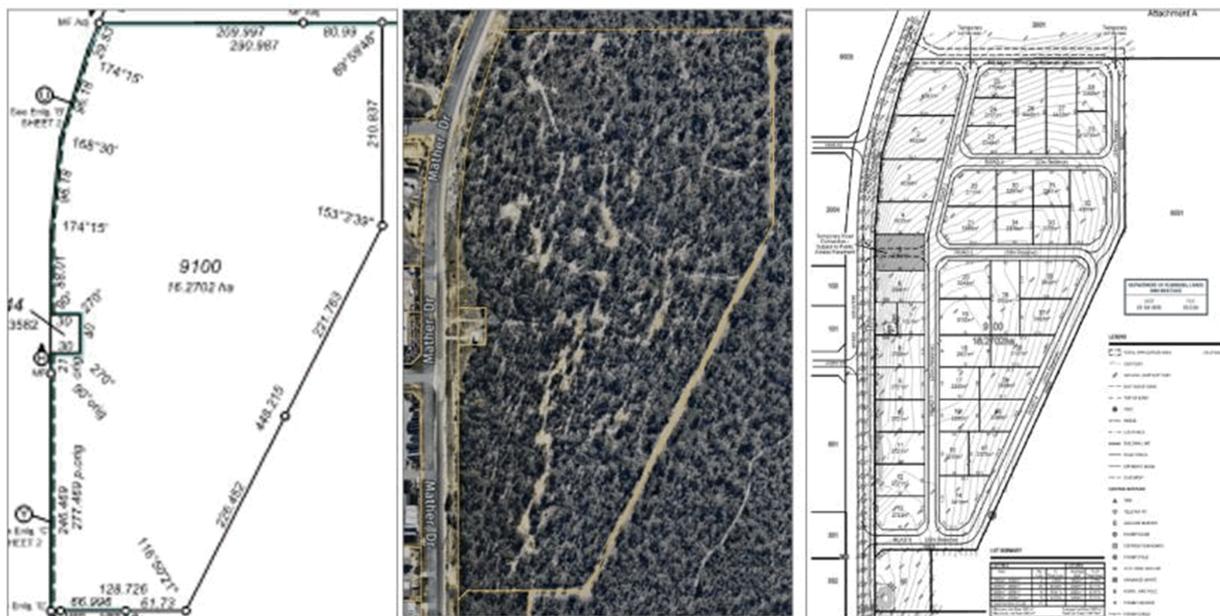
Lot 9100 illustrated on the site plan (left), current status (centre) and approved subdivision plan (right)
